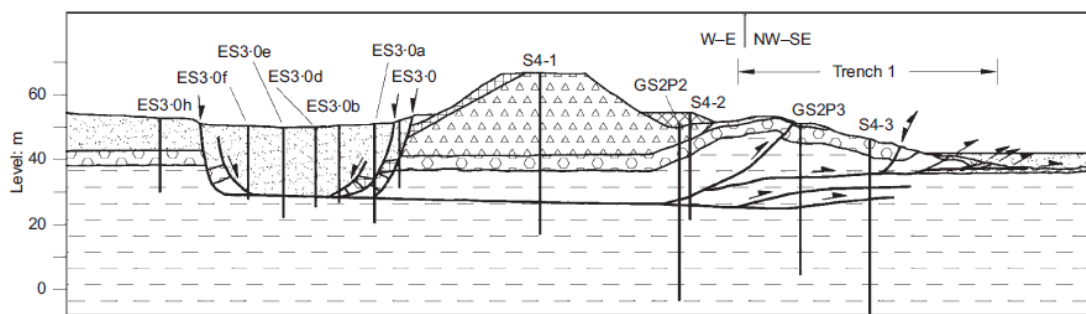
Post failure cross-section of Aznalcóllar Tailings Dam: (Alonso & Gens, 2006a)
